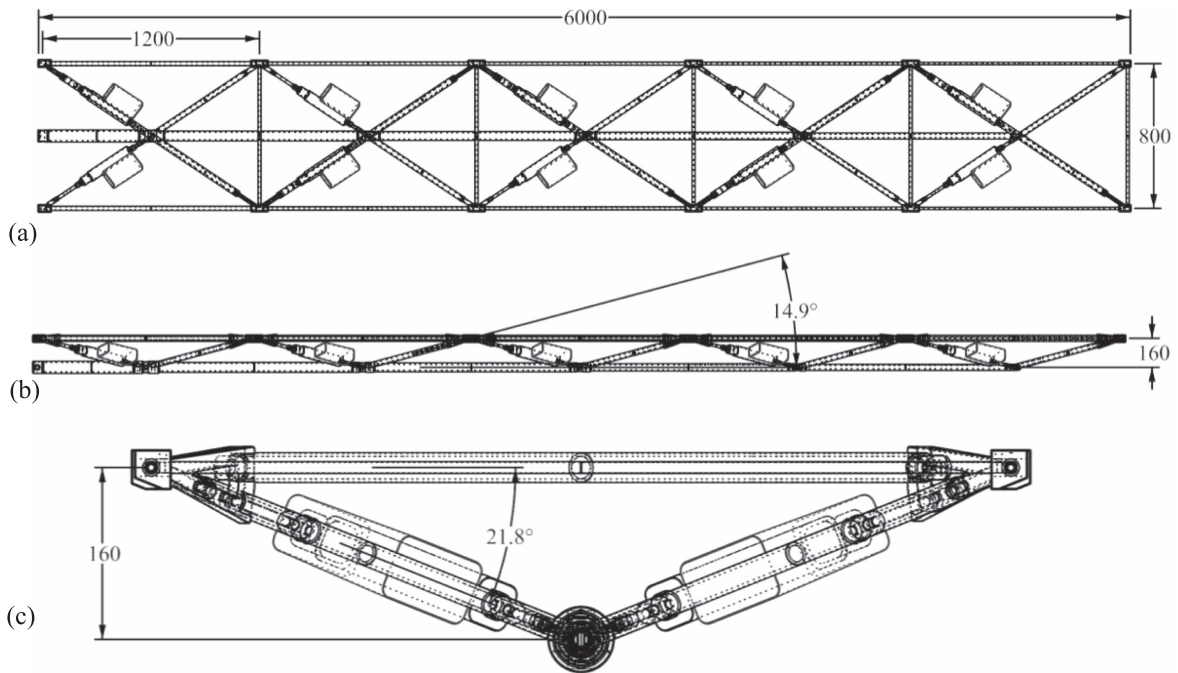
Adaptive truss dimensions (a) plan view, (b) elevation, (c) side view.
